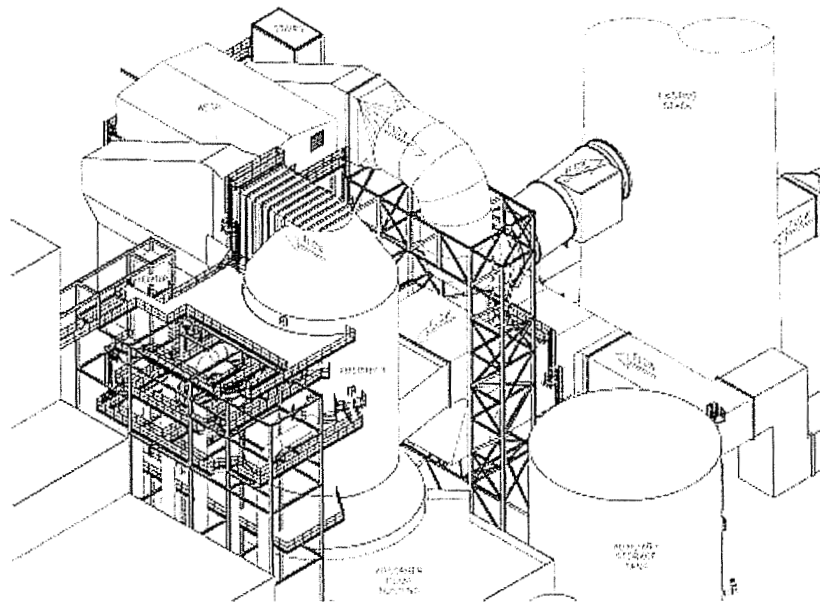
Proposed Absorber-WESP Arrangement: Isometric View
